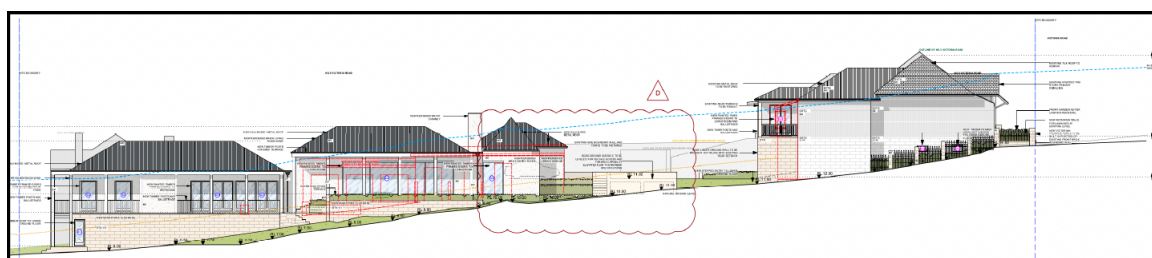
Western elevation showing contravention (in blue dashed line) in the context of the existing dwelling (to right).
